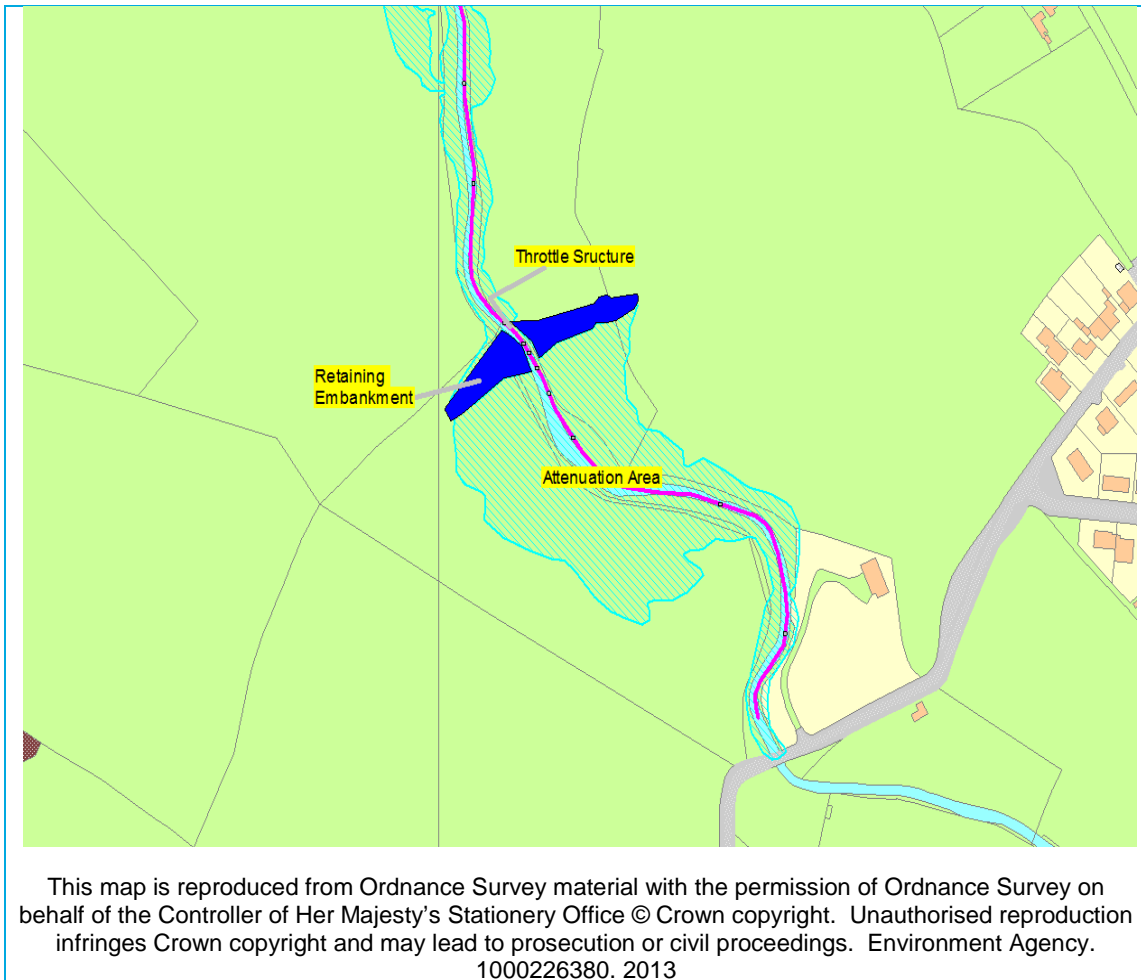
Wiza Beck Flood Retention Basin: structures
